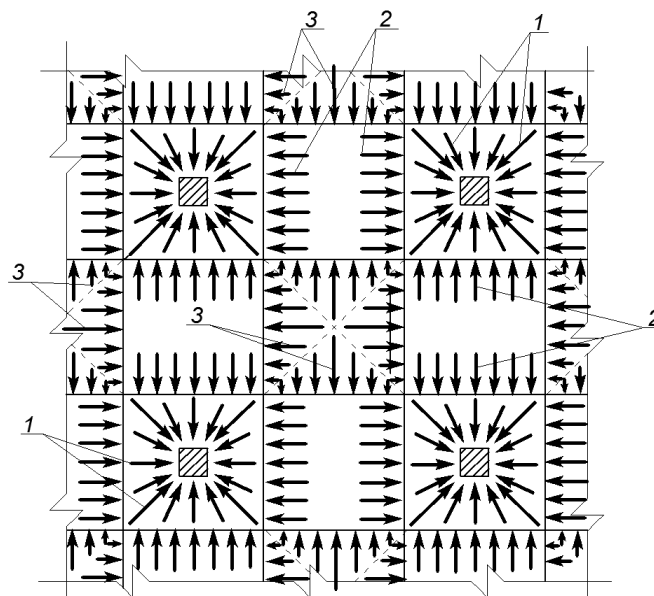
Design diagram of the load transfer in the precast flat slab column frame: 1 – from the column drops to the column; 2 – from the intercolumnar plates to the column drops; 3 – from the central plates to the intercolumnar plates
